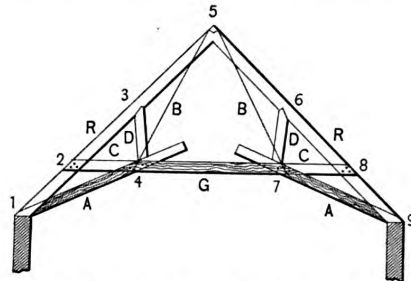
Another Form of Truss where Level Ceiling is Desired in the Center.
